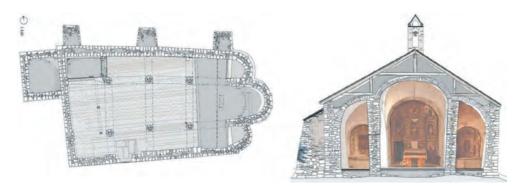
Plan and section of Santa Eulària d'Unha [11].
